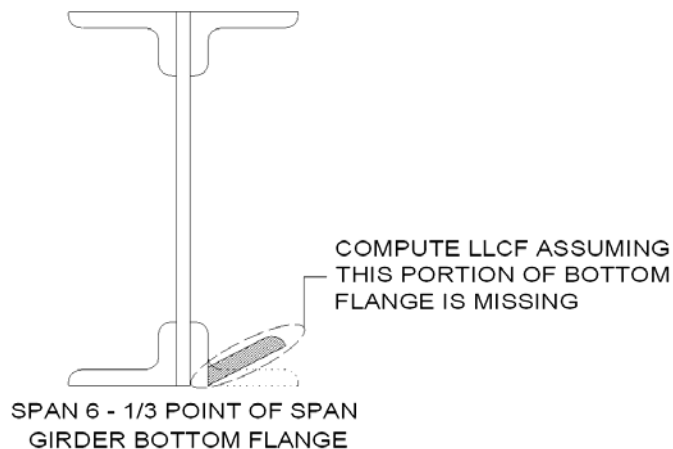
Damaged Girder Bottom Flange in Span 6
